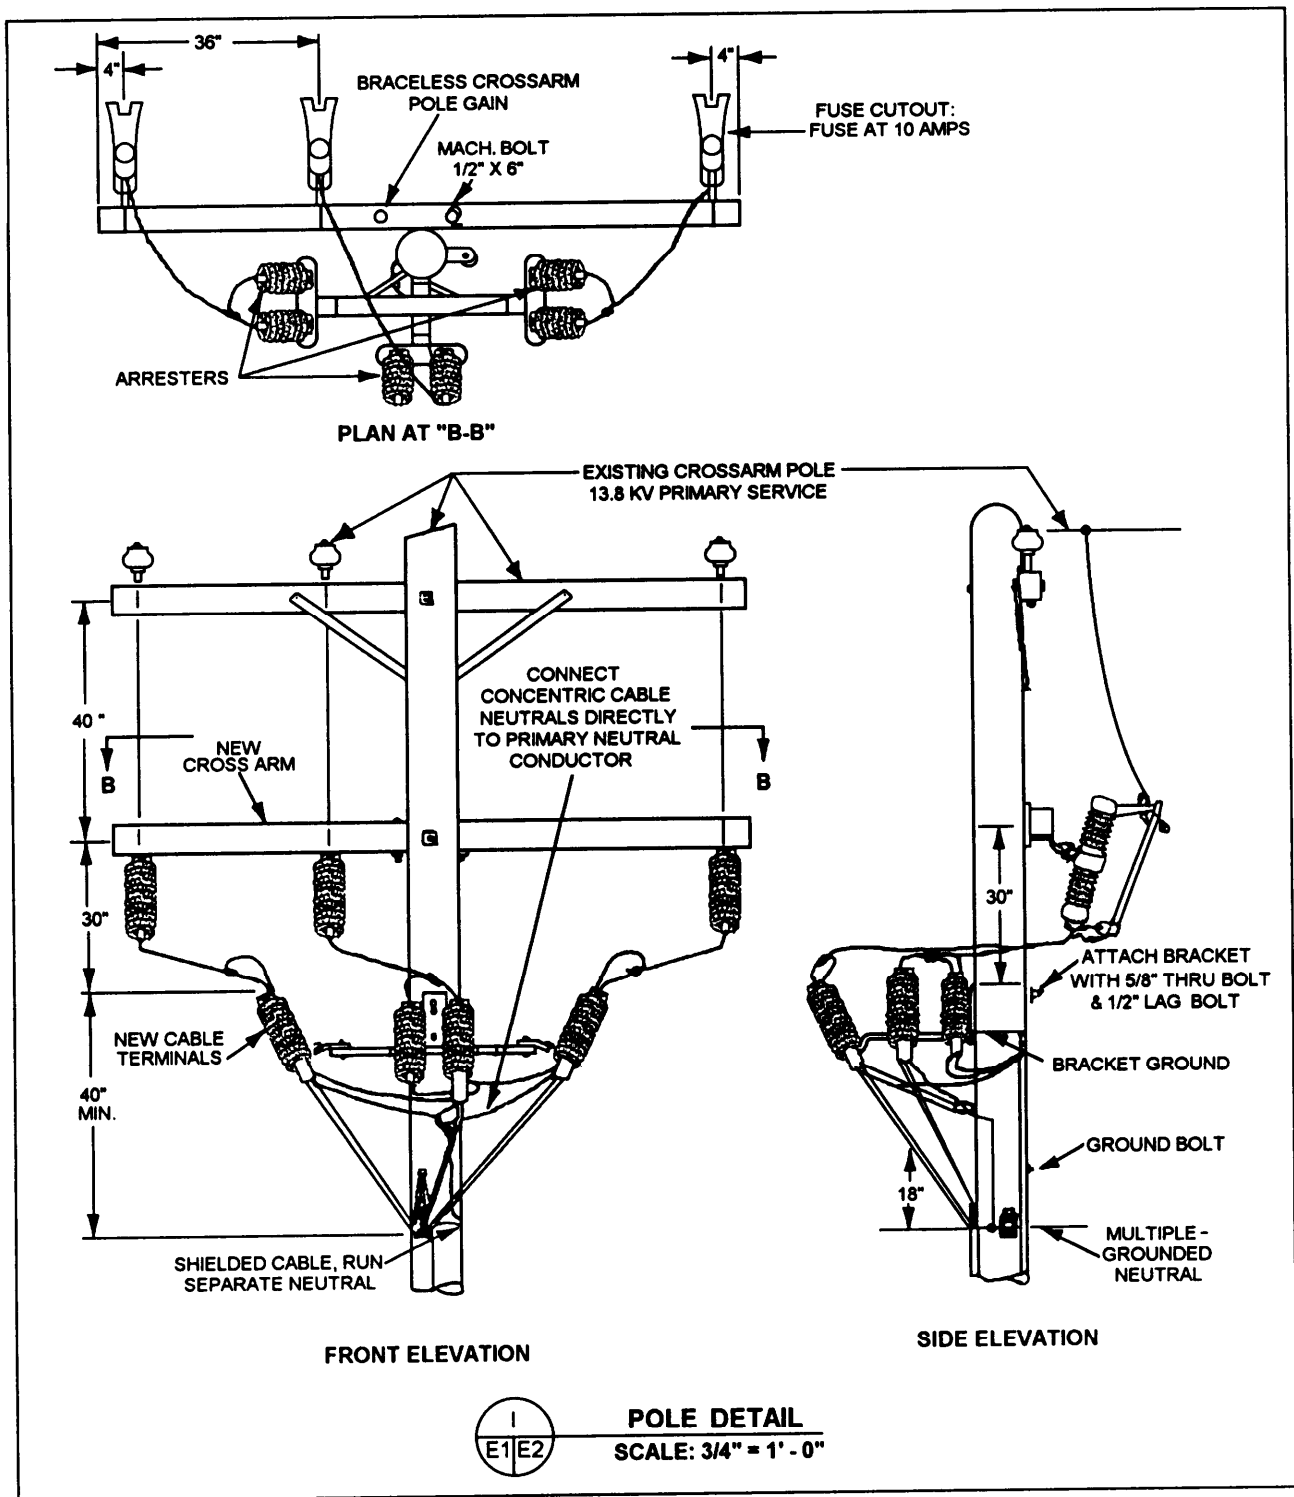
Pole detail for use with the site plan shown in figure 2-15.
